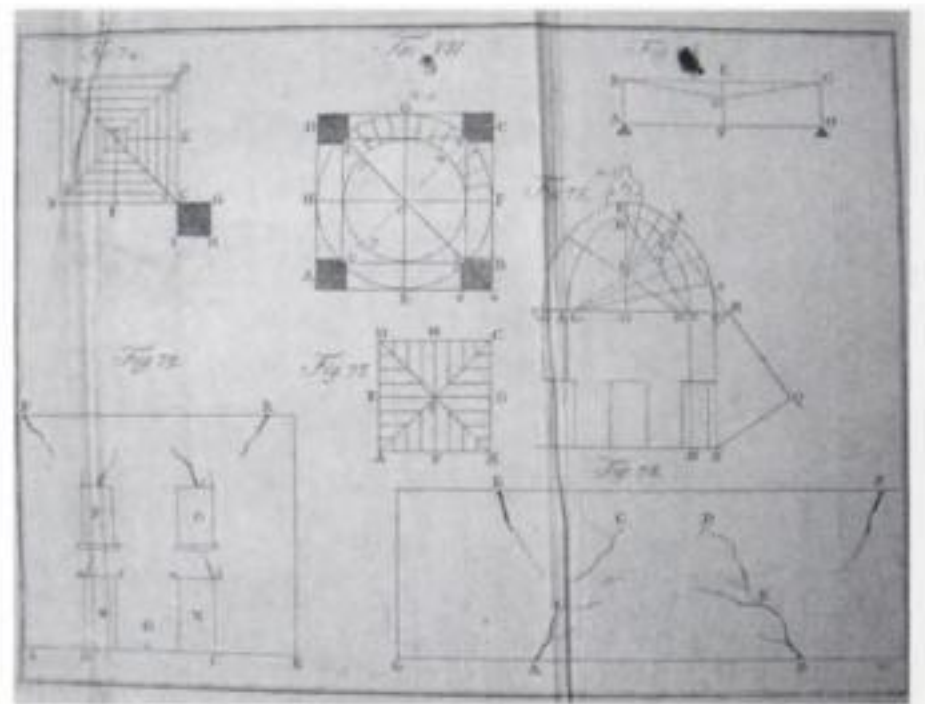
V. Lamberti. Building Statics. Tav. VII.
